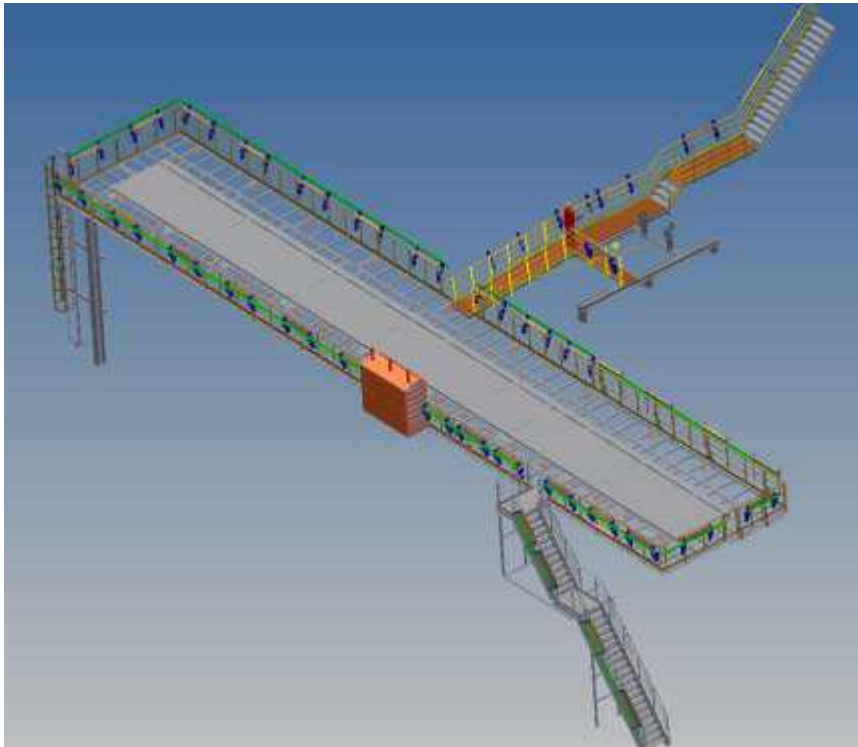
Walkways and stairs around Well Service Deck/Gooseneck Hook-up Frame
